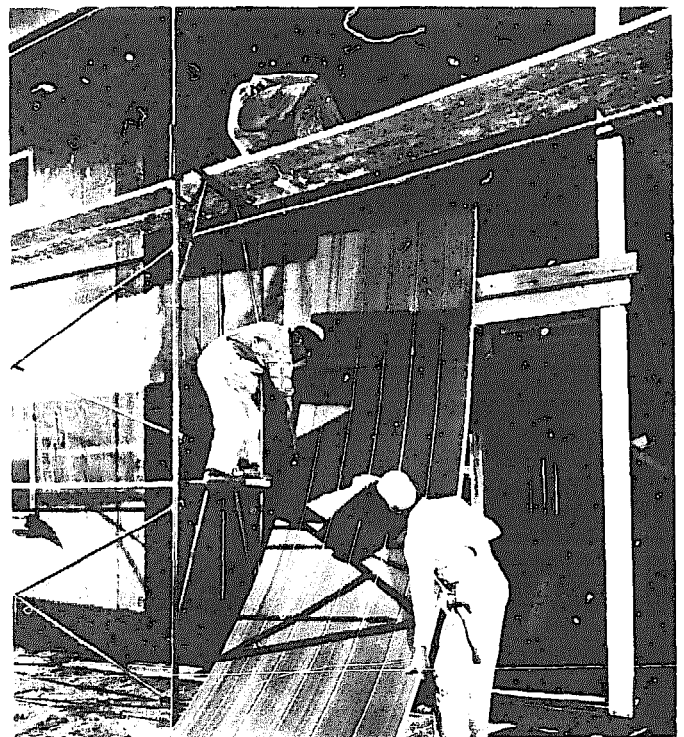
A 16-foot hardboard panel is applied quickly to a sidewall of a two-story building.
